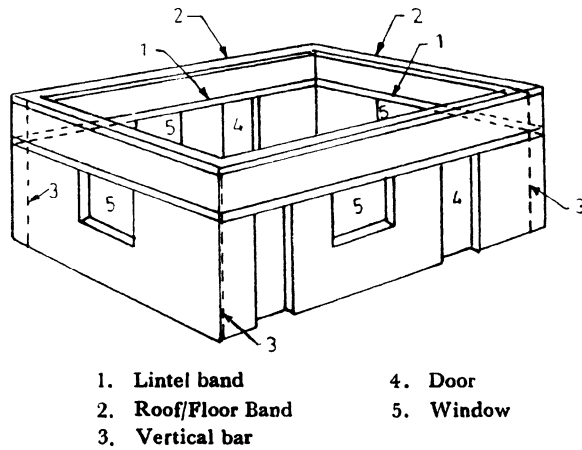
OVERALL ARRANGEMENT OF REINFORCING MASONRY BUILDINGS
